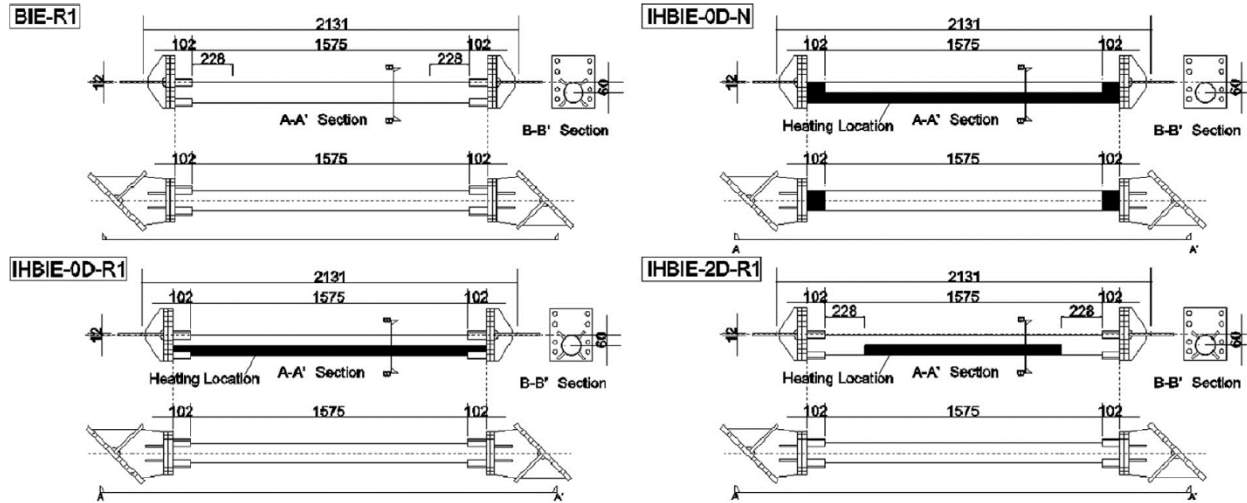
Dimensions and configuration details of test specimens (from [26])
